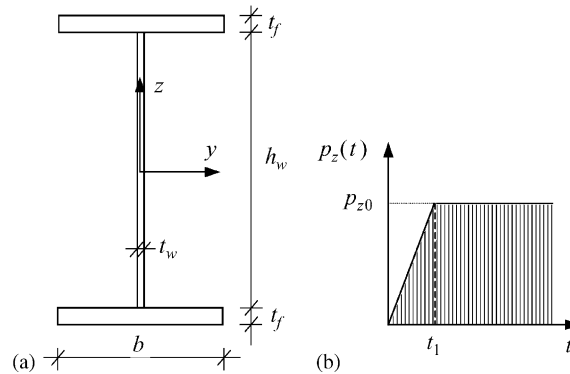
(a) Cross-section of the steel I-section beam, (b) load history of the “static” load.
